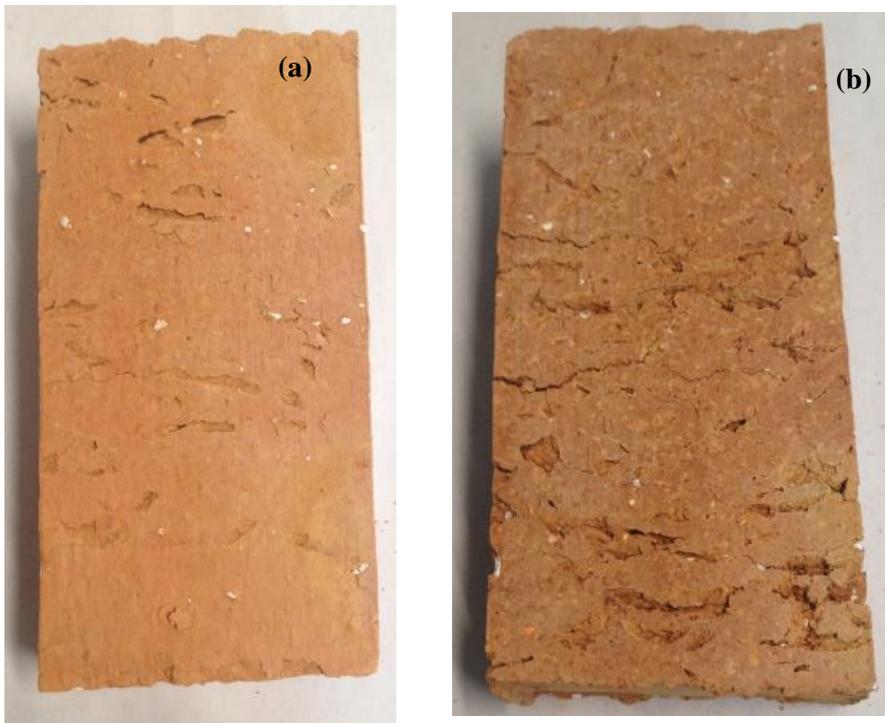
General appearance of facing bricks: (a) facing bricks with 5% paper mill residue and (b) facing bricks with 7% paper mill residue
